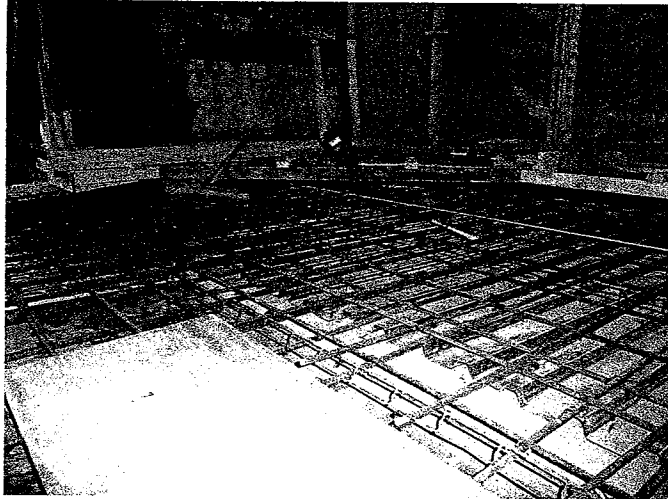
Reinforcement and deck at main entrance slab (grid A/5.5). Note vibrator in background.
